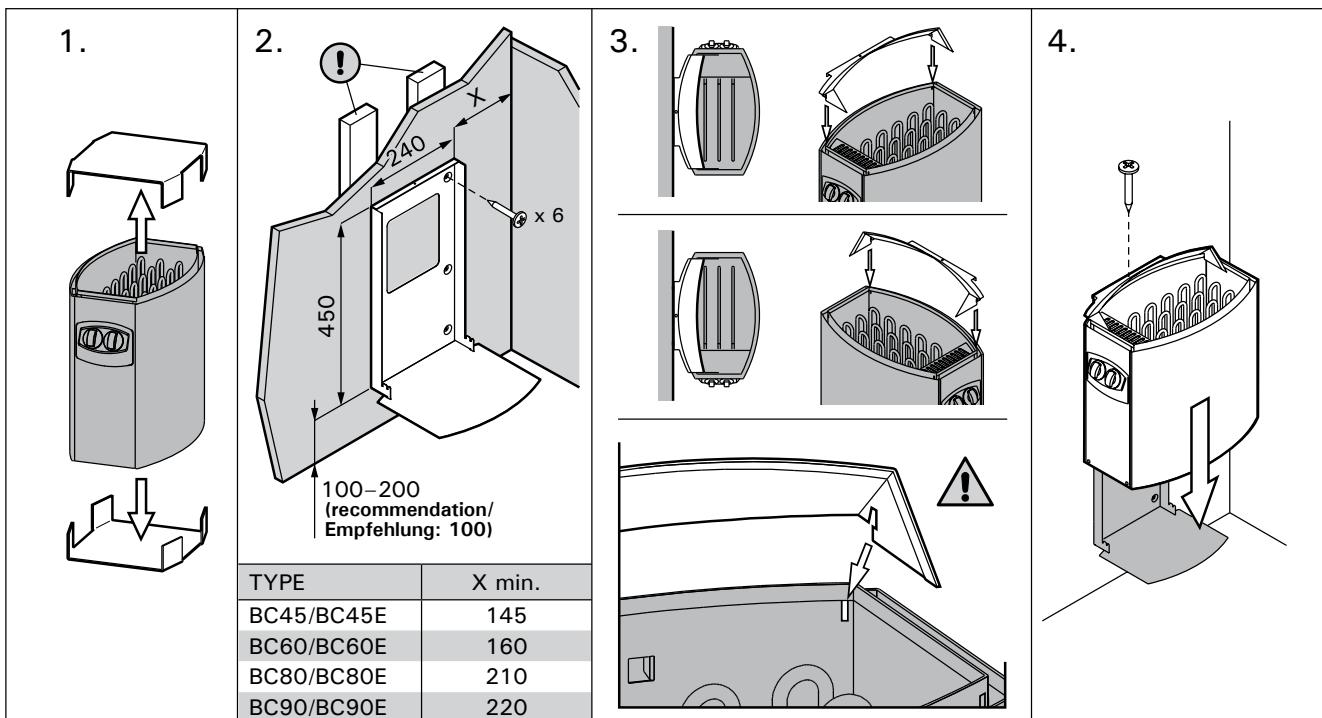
Fastening the heater on a wall (all dimensions in millimeters)
